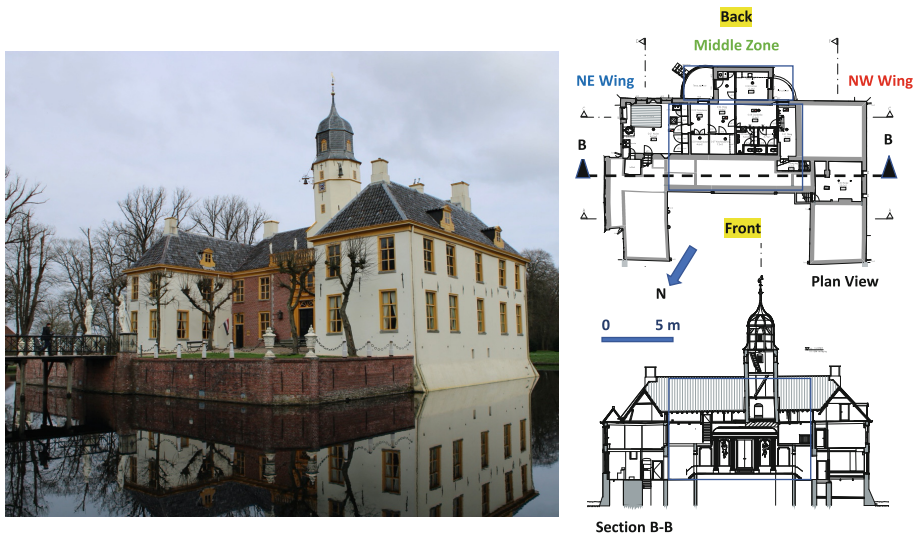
Fraeylemaborg (left) and its plan views (right).
